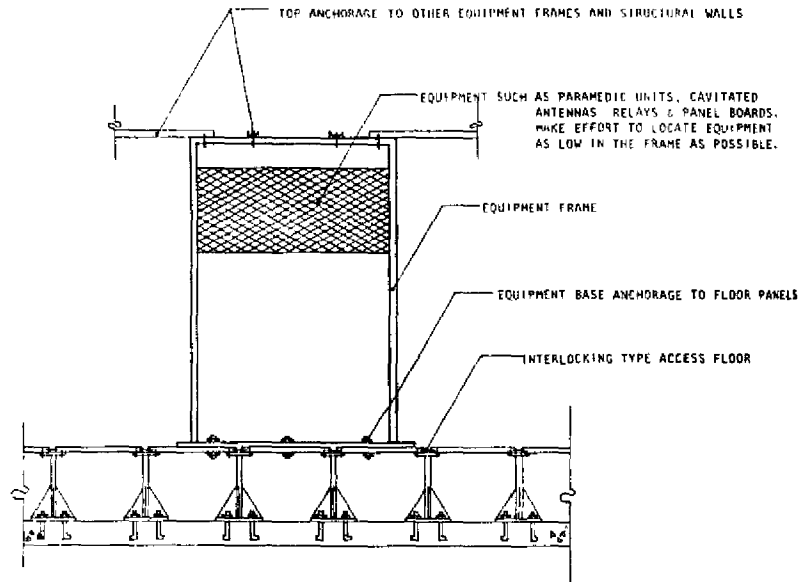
Communication systems. Equipment frame anchorage to interlocking type access floor
